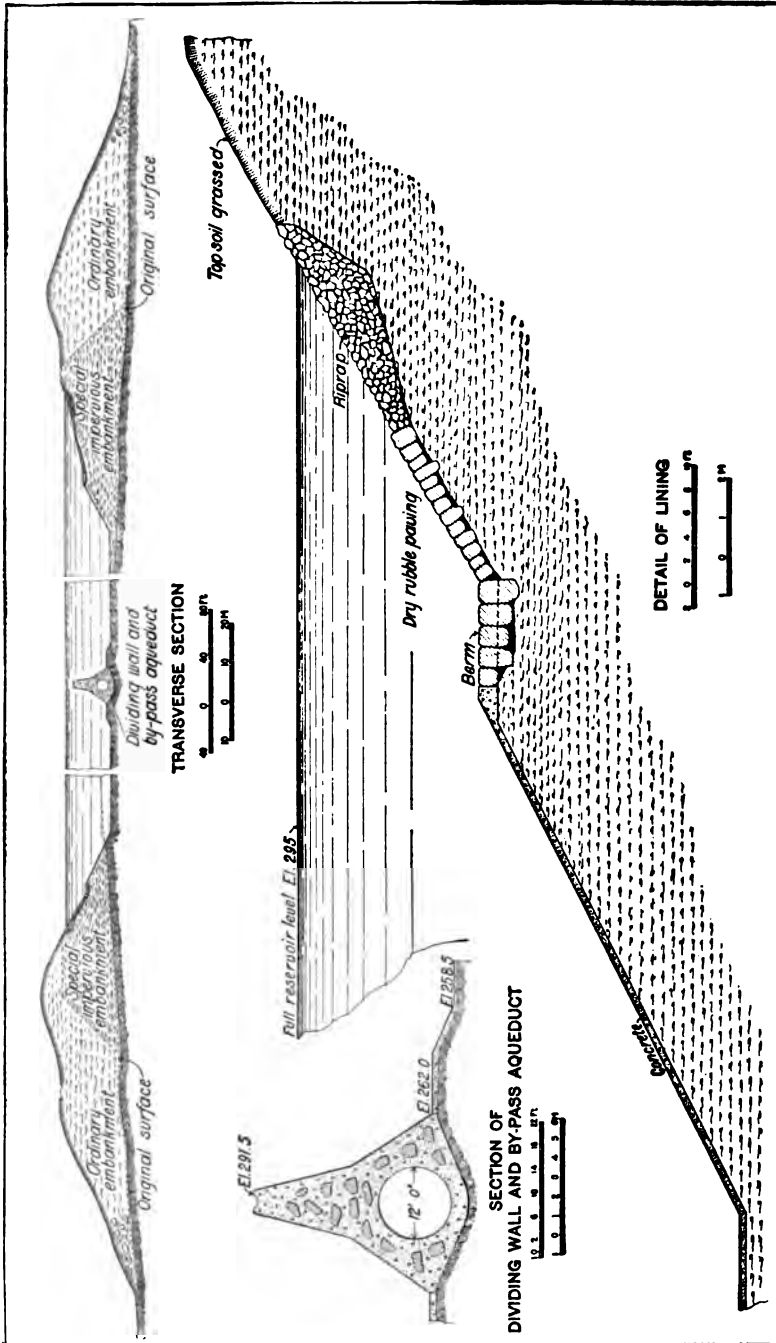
Embankment and By-pass Aqueduct of Hill View Reservoir. Details of Construction.
